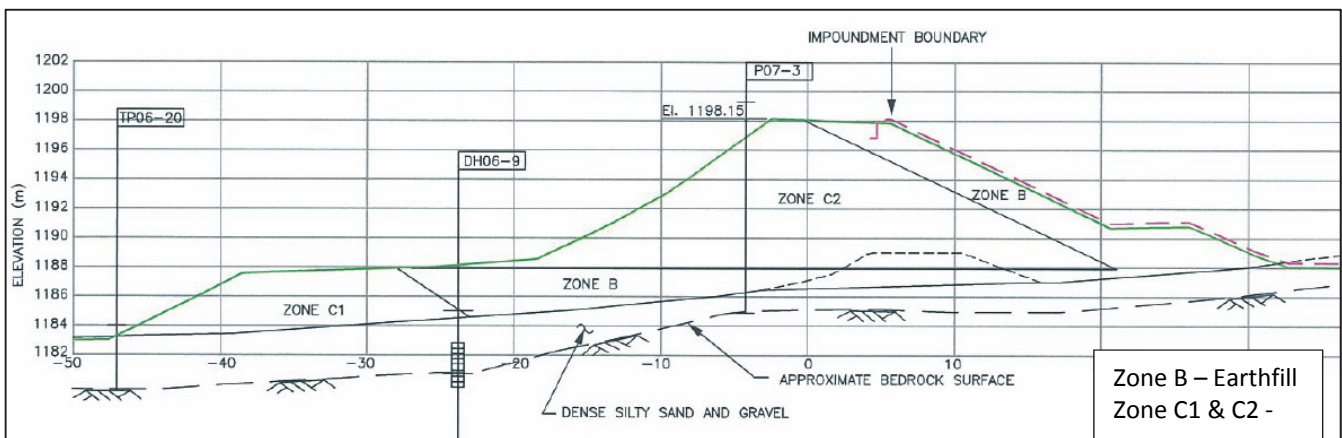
Typical Embankment Cross Section (Sta. 3+50)
